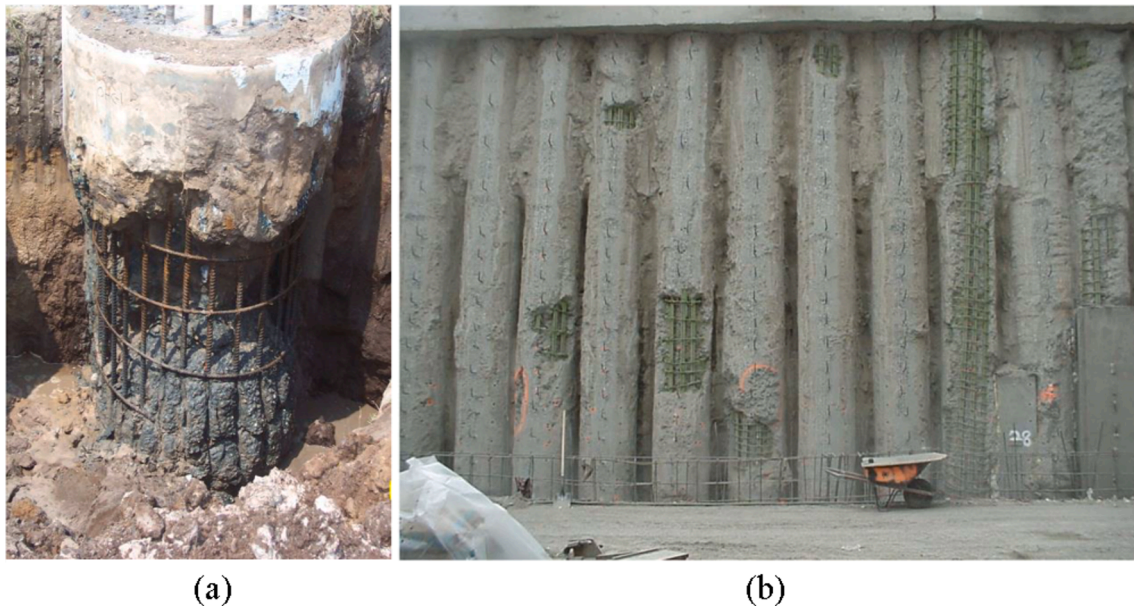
(a) A drilled shaft with severe necking; (b) a soldier pile wall with numerous defects [24].
